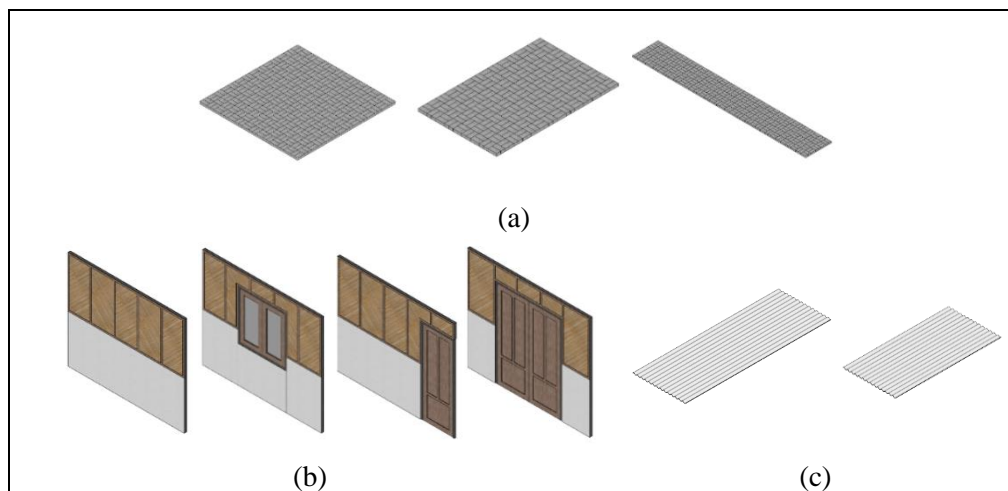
House envelope panels ((a) Floor panels (paving block); (b) wall panels (combinations of pine-wood, *gedhek* and calciboard); (c) roof panels (fibercement roof))
